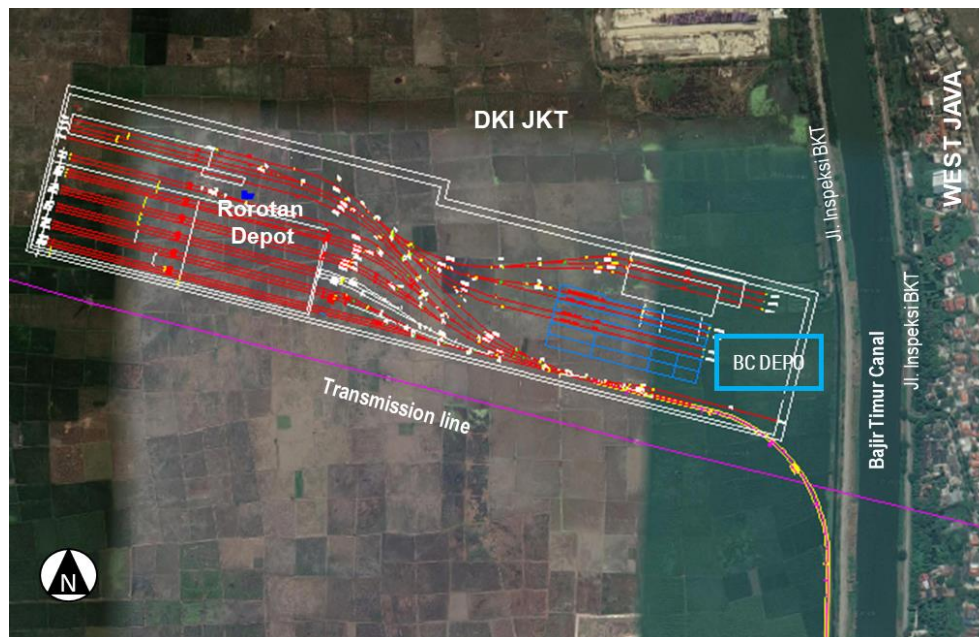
DEPO Basecamp Location Plan (Tentative)
